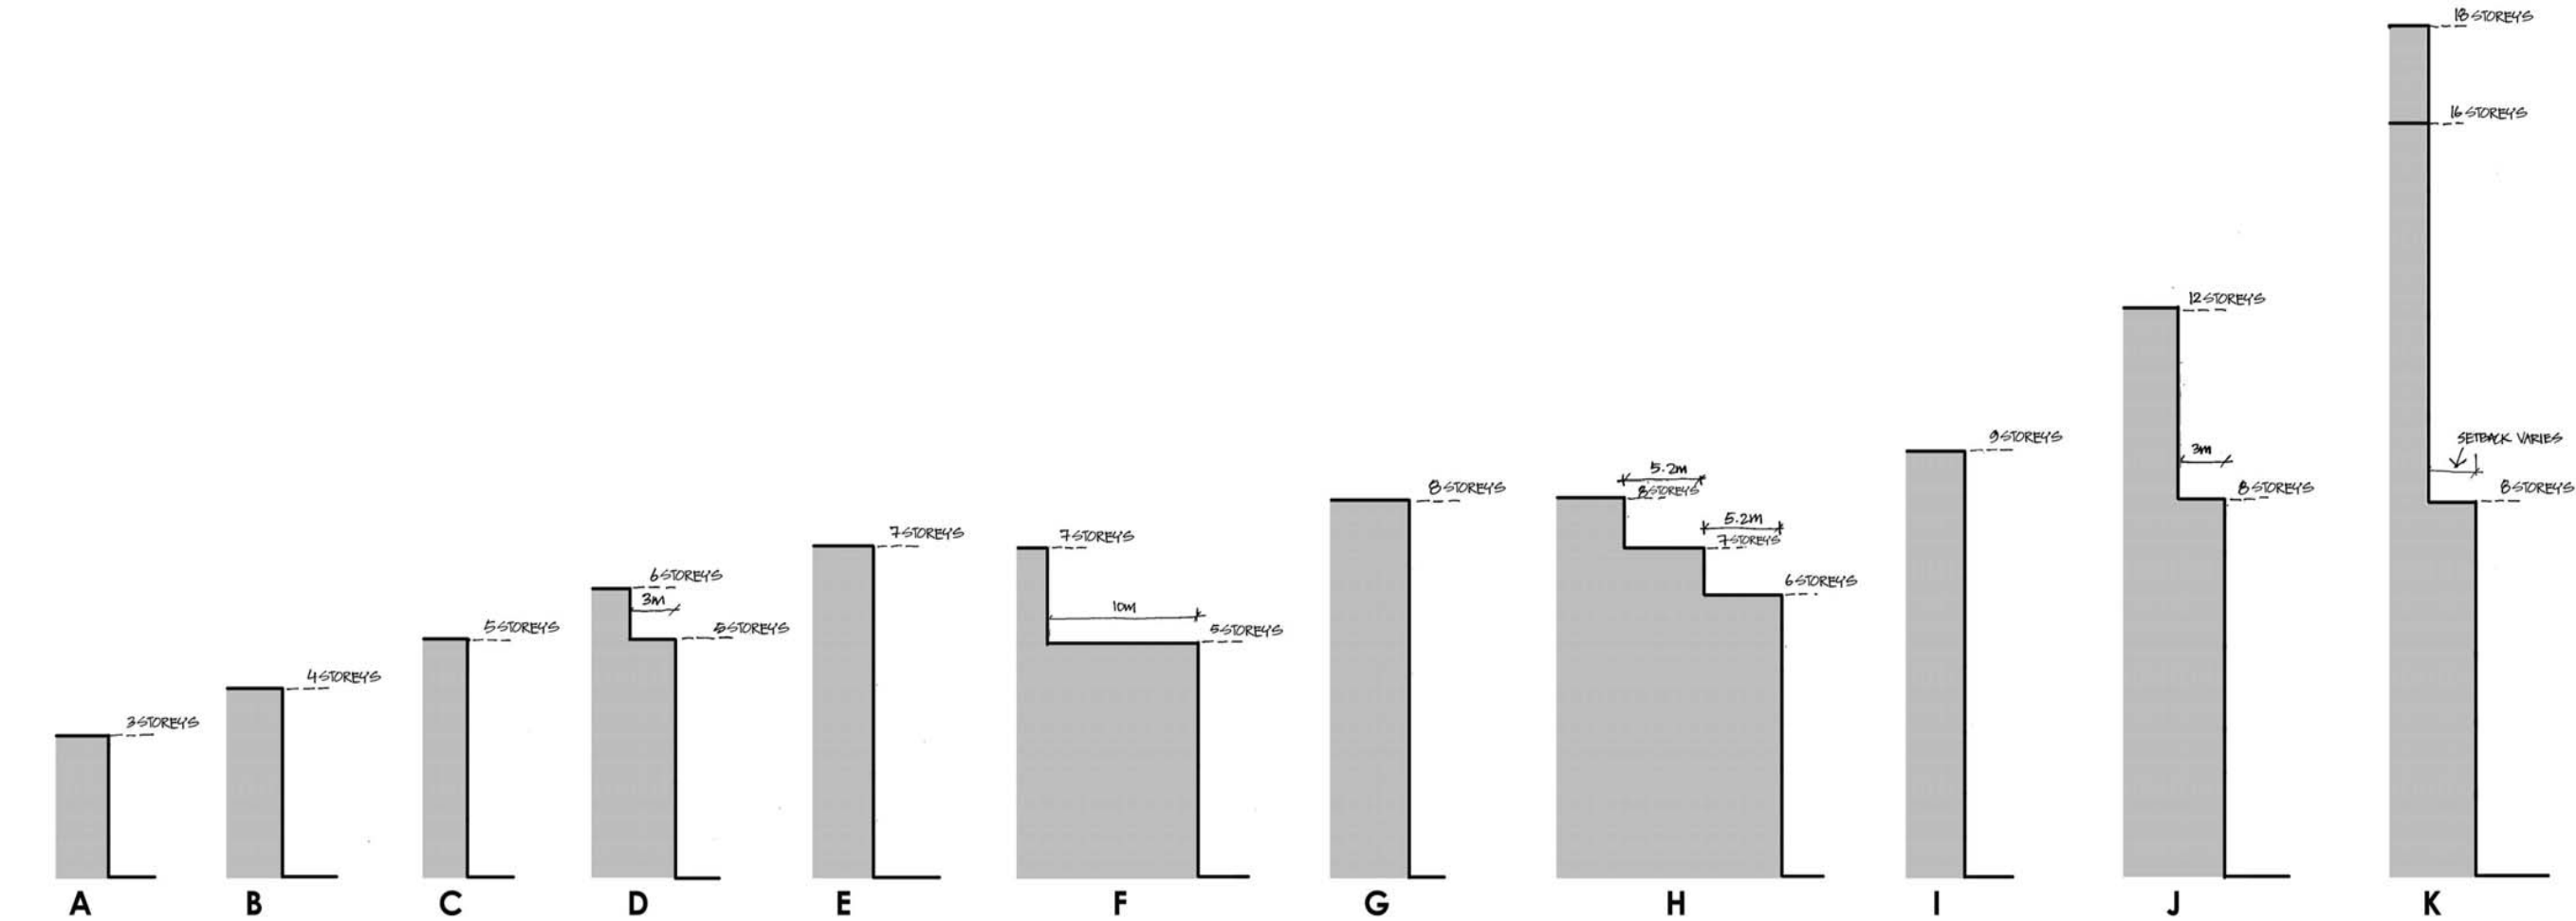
STREET WALL SECTION TYPOLOGIES (REFER TO ASSOCIATED STREET WALL ELEVATIONS, PAGES 50 & 51 AND BUILDING SETBACKS MAP, PAGE 55)
